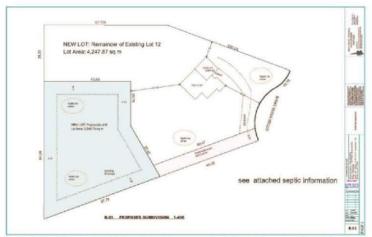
Site Plan showing the location of the proposed subdivision Lots, location of the building area, septic disposal fields (approved by Island Health), and the panhandle access driveway.
